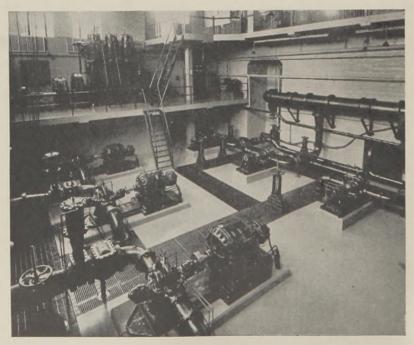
Mt. Clemens, Mich., Pumping Station. All pipes and pumps are protected with Inertol Standard. The floor of the Pumping Station is painted with Ramuc Enamel Gray No. 308.
